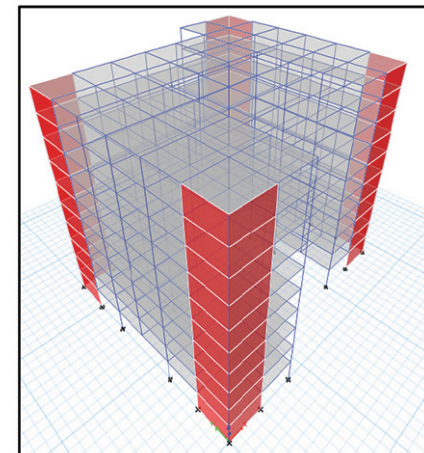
Irregular model with floating column and shear wall at Type-2 location – A9
